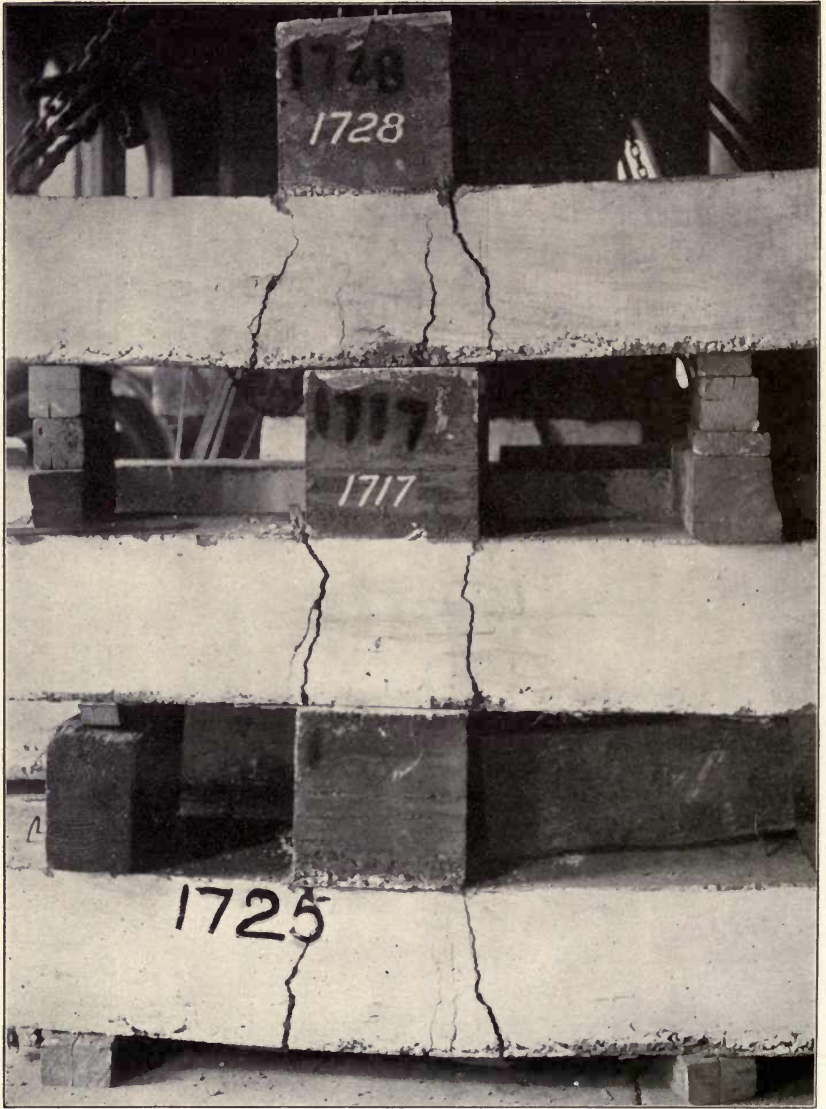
VIEWS OF REINFORCED CONCRETE WALL FOOTINGS AFTER TEST.
